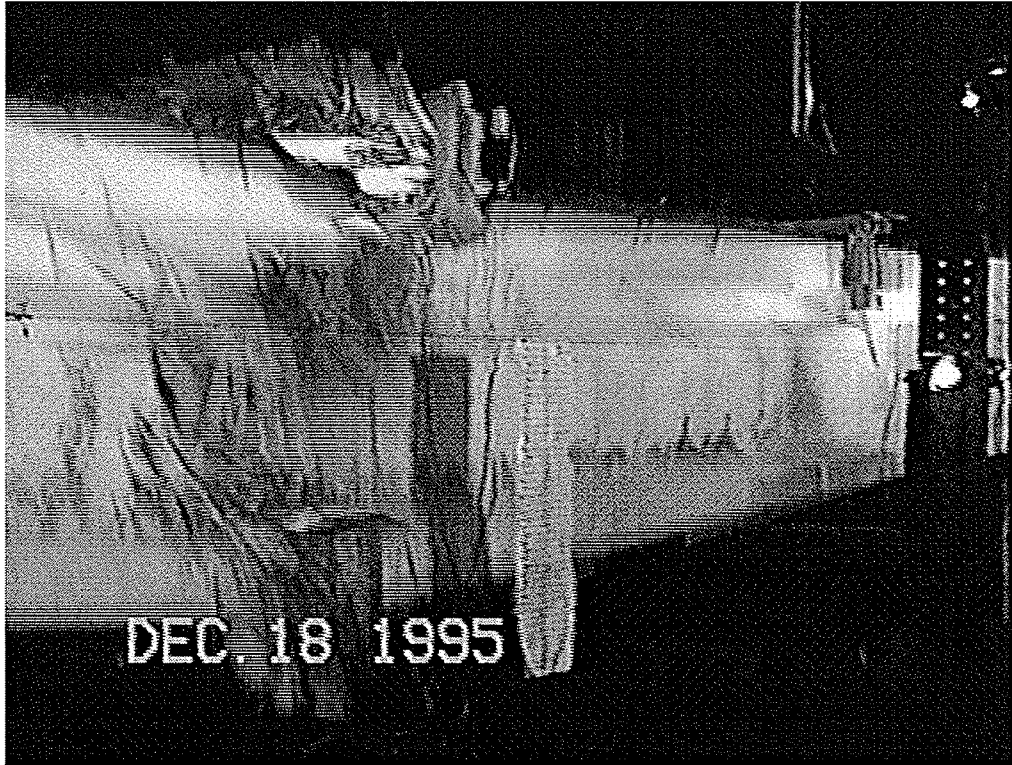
Girder I, Deck Failure, Web Failure Begins
